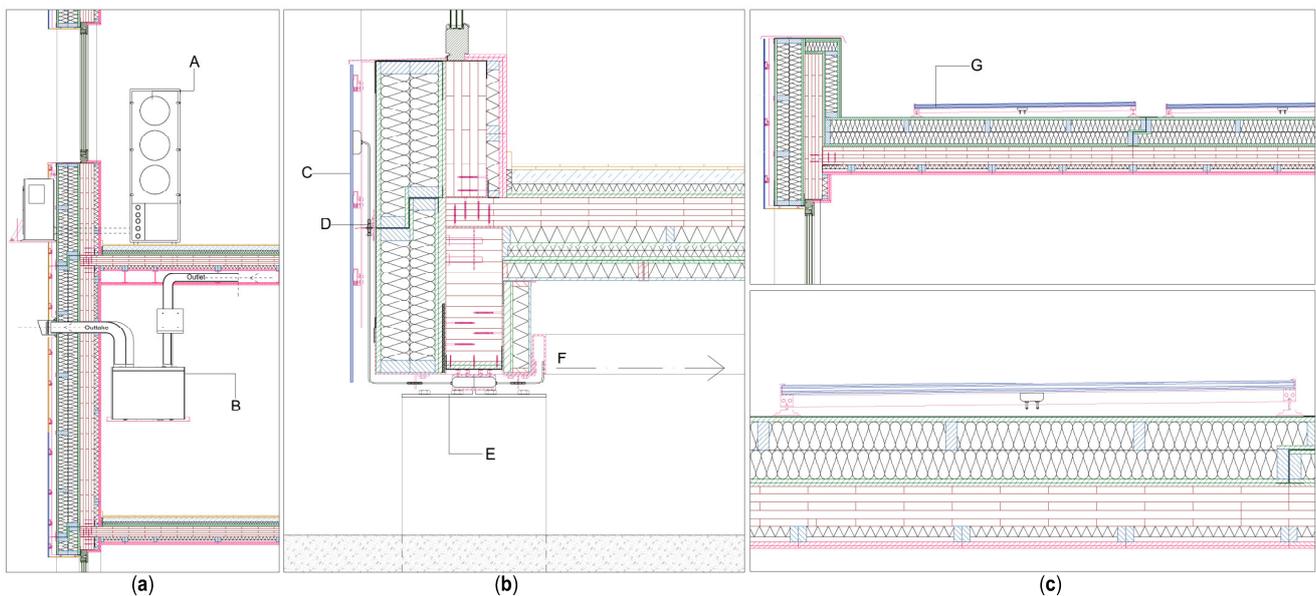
(a) BIPV module mounting system on two prefabricated façade renovation components of the building renovation system with façade cladding panels, integration of an air-to-air heat pump outdoor unit connected to an indoor unit (A), and penetration of air in- and outlet air ducts for a mechanical ventilation system with heat recovery (B); (b) ground floor connection of BIPV (C) electricity cabling (D) using a multiple string connector (E) and a cable duct with the inverter in the basement (F); (c) building extension and façade and roof renovation component sections with BIPV modules in the façade and on the roof (G).
